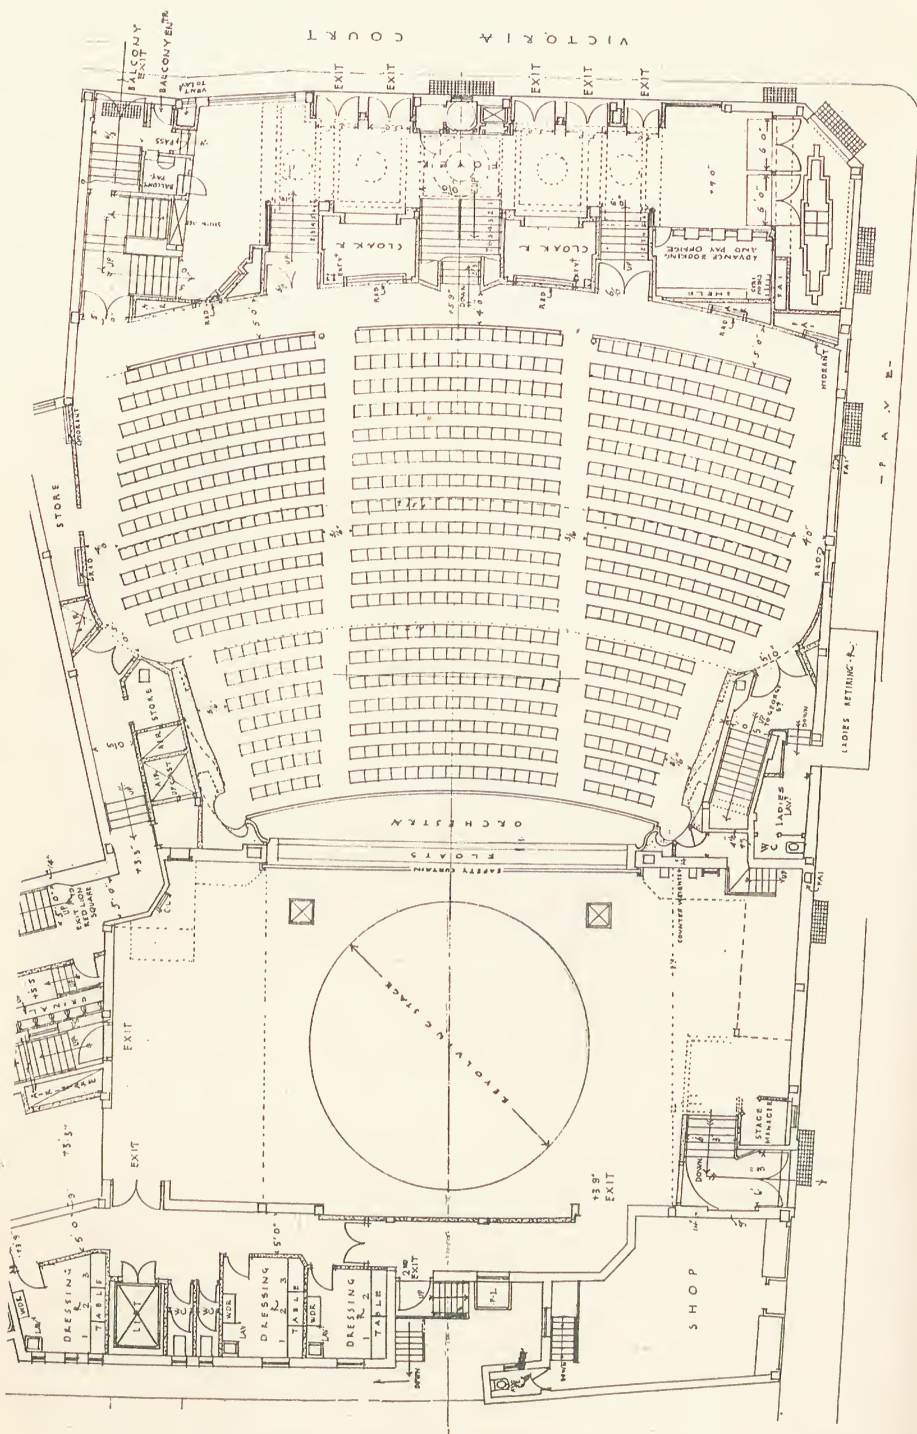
NEW THEATRE, OXFORD—GROUND-FLOOR PLAN
